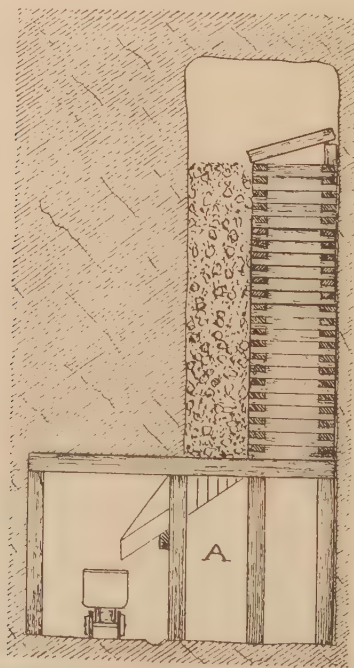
Cross-section showing small initial rise, Rolling Mill Mine, Michigan.
